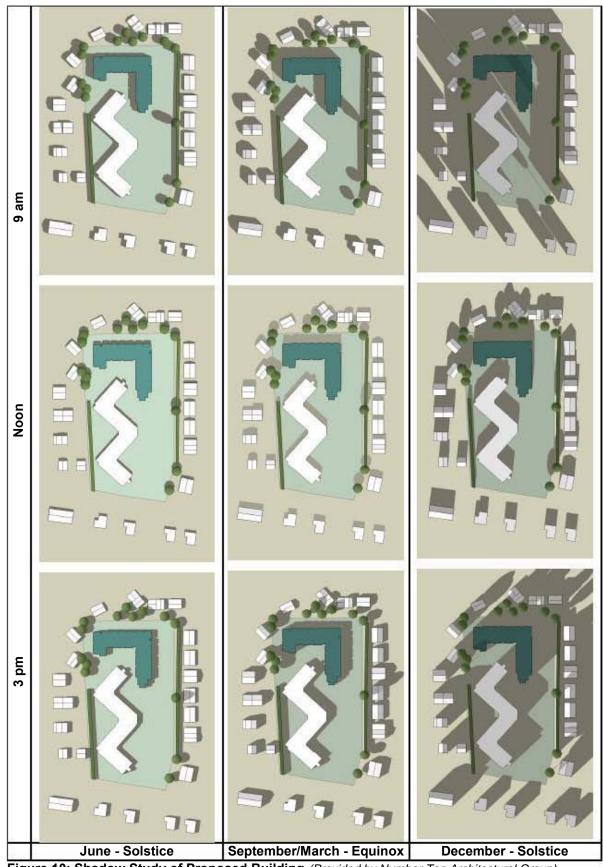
Shadow Study of Proposed Building (Provided by Number Ten Architectural Group)
